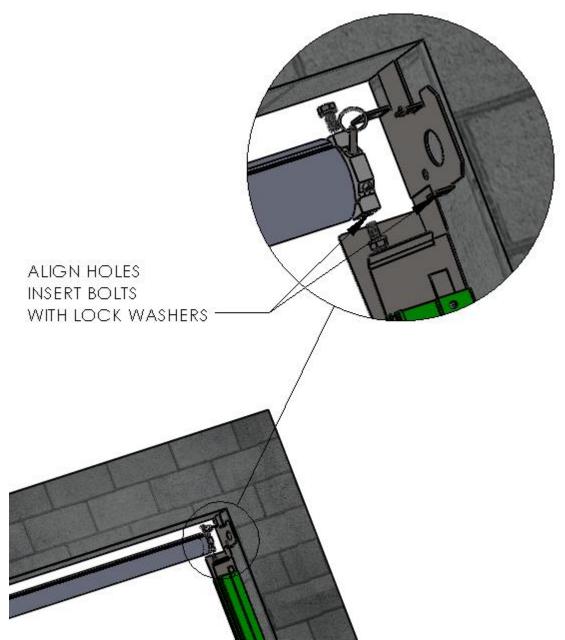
INSTALL R.H. SIDE OF HEADER ASSEMBLY
